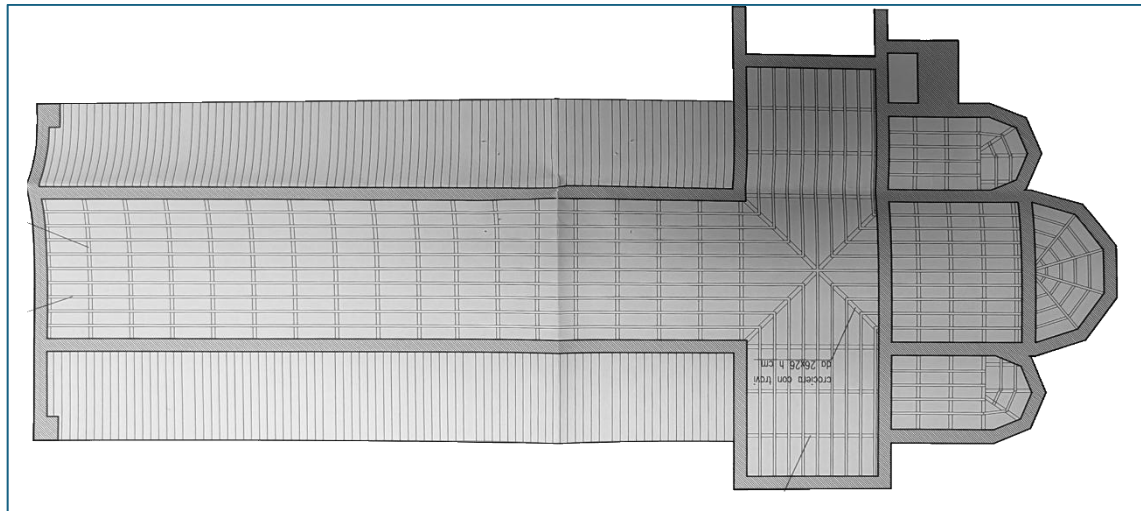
Vicenza, Basilica of San Lorenzo, attic plan with indication of the timber trusses. (Source: SABAP VR-RO-VI)
